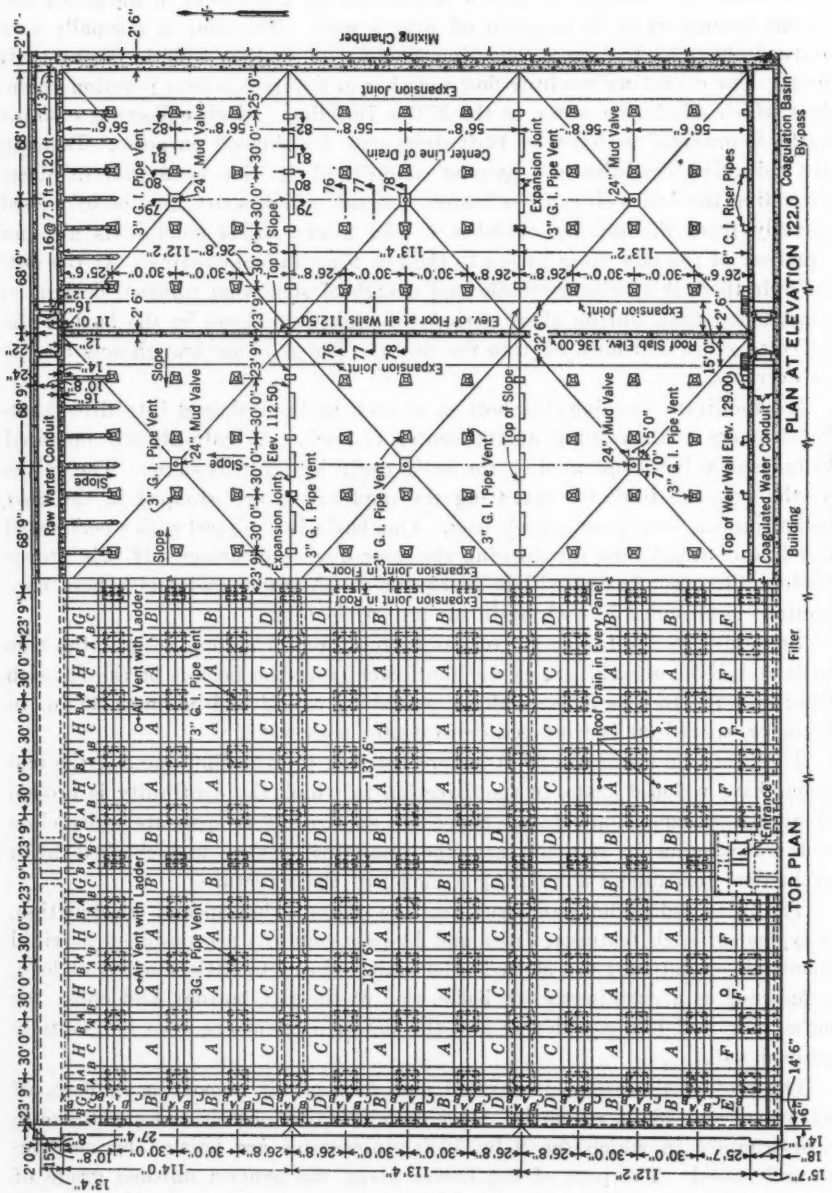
GENERAL PLAN OF SETTLING BASIN
